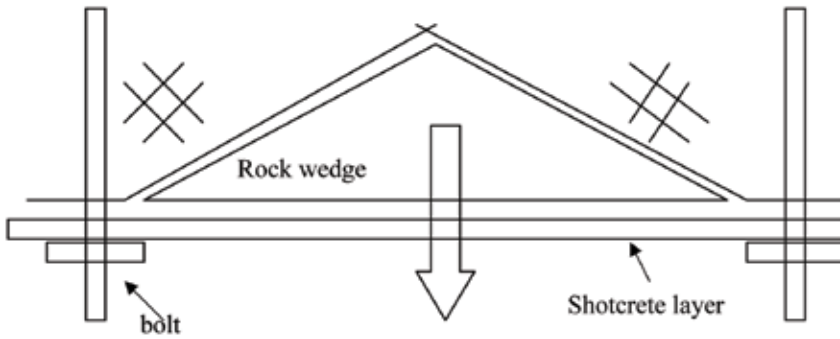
Typical rock wedge failure that relies on safe shotcrete support
